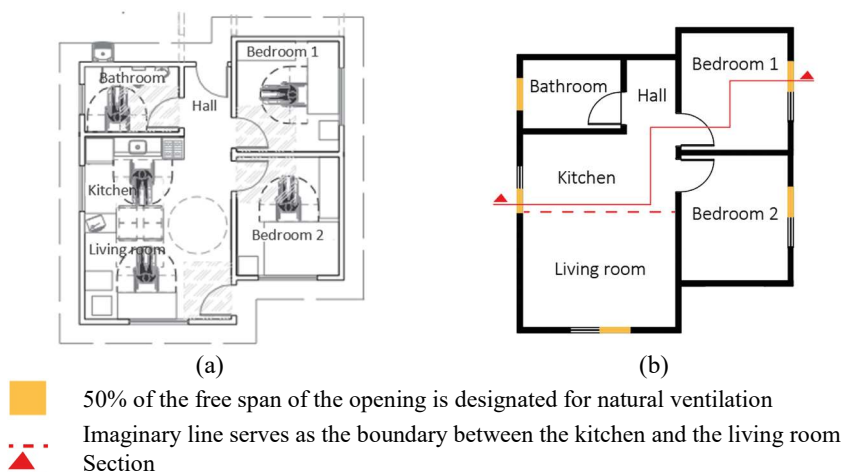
(a) Model of the floor plan of a representative HIS [14], and (b) Model of the floor plan [15].
